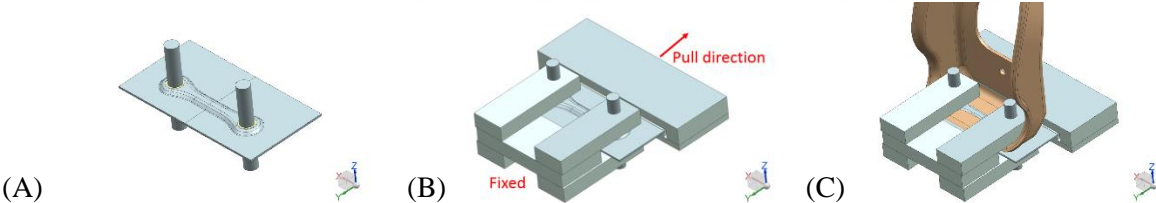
(A) Specimen with pins, (B) specimen with clamps and (C) clamping device located at the bracket
